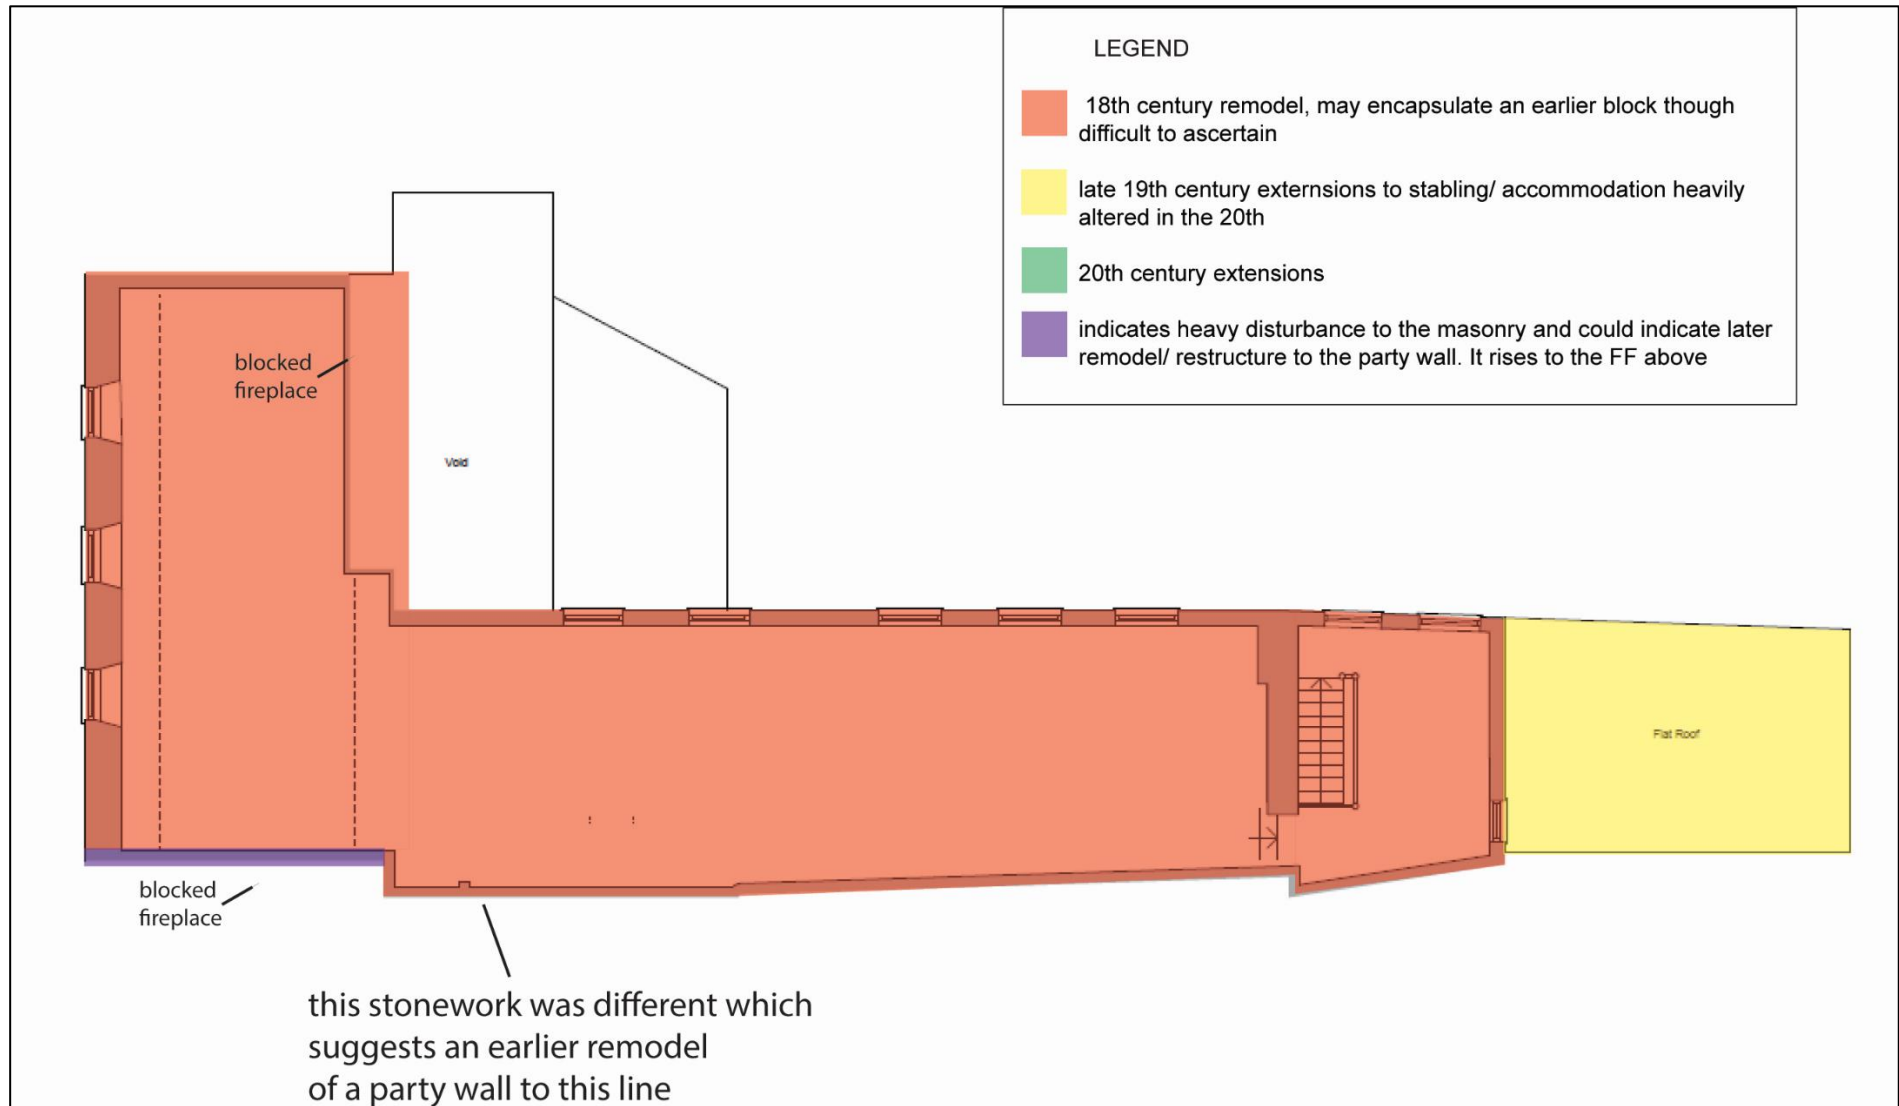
FIRST FLOOR PHASING BASED ON EVIDENCE SEEN INTERNALLY AND CAU'S EARLIER APPRAISAL WORKS. NOT TO SCALE.
